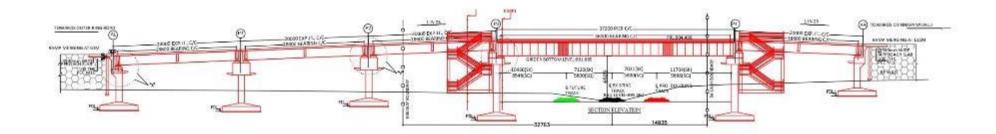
Typical Arrangement of RUB Proposed in BSRP
